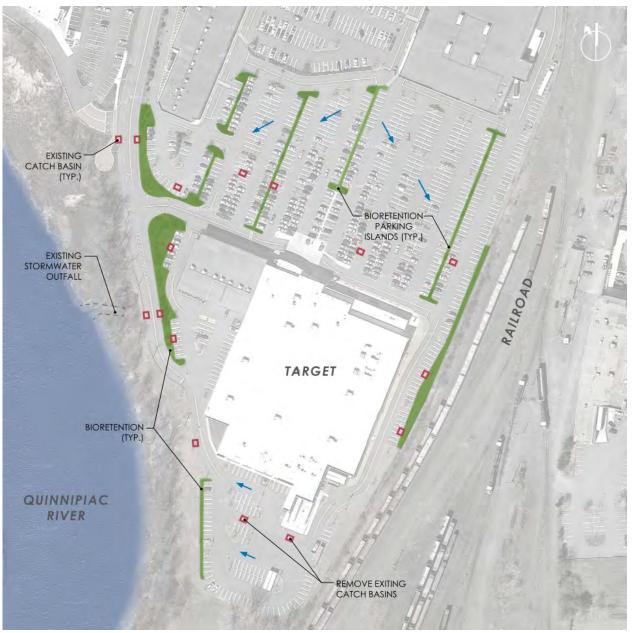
North Haven Shopping Mall Green Infrastructure Retrofit Concept
